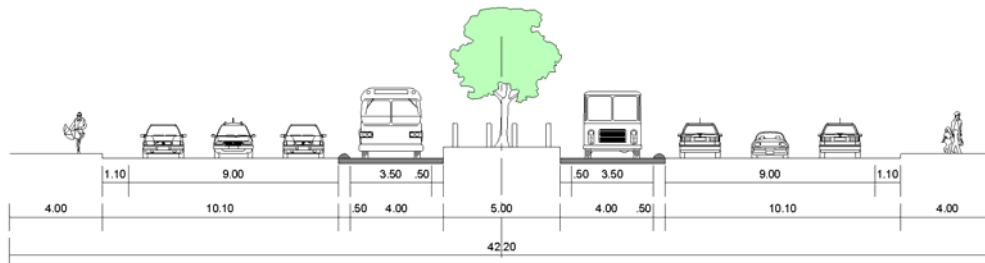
Planned Cross Sections on Avenida Almirante Barroso
